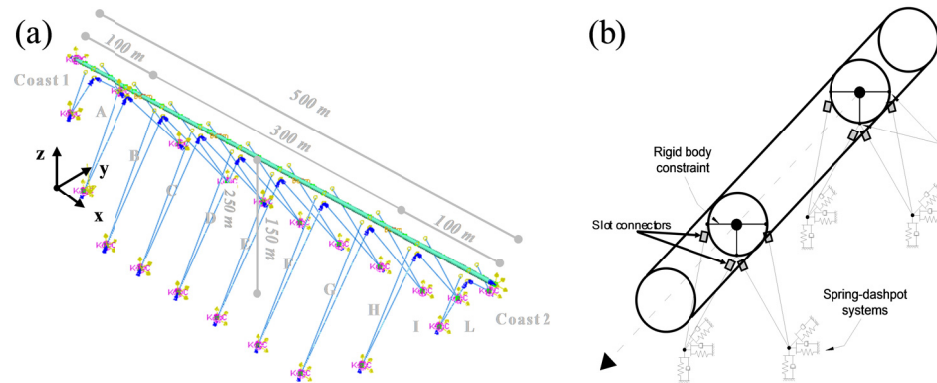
(a) perspective view of the F.E model; (b) Detail of the modelling of connections between the anchorages and the tunnel and of the ground-foundation systems.
